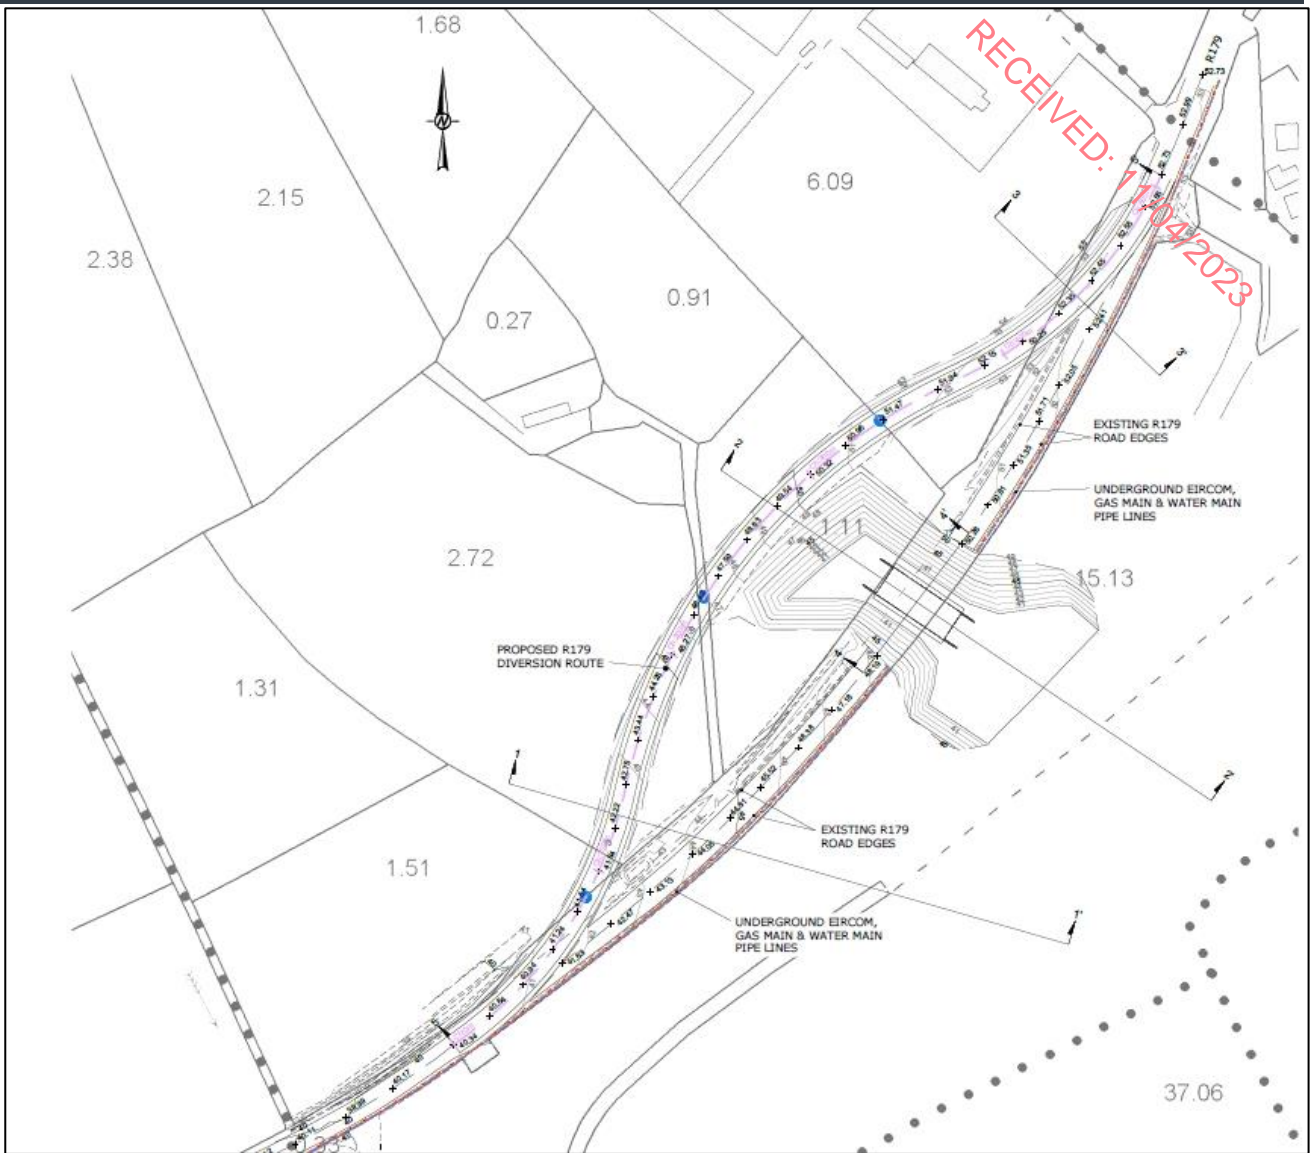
Proposed Development Site Layout showing Cut-and-Cover Tunnel
